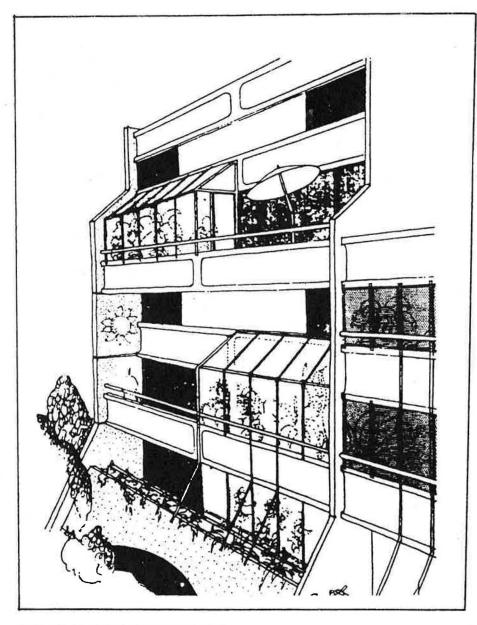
Sketch of a typical façade with the builtin sunspaces
